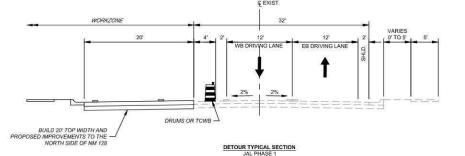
C. NM 128 MOT Typical Section – Jal Three Lane Construction
